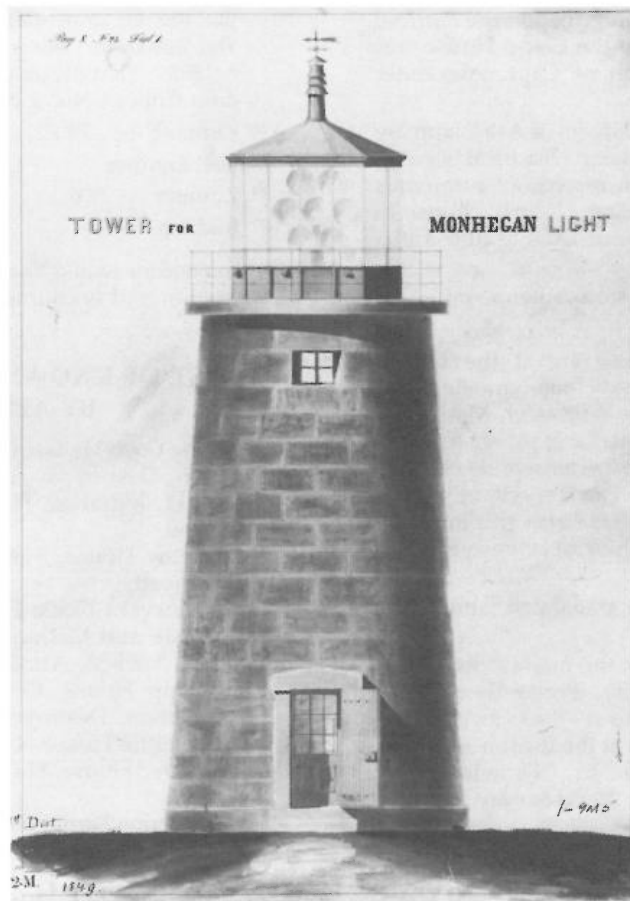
Elevation of Monhegan Light, drawing dated 1849, tower built 1851
